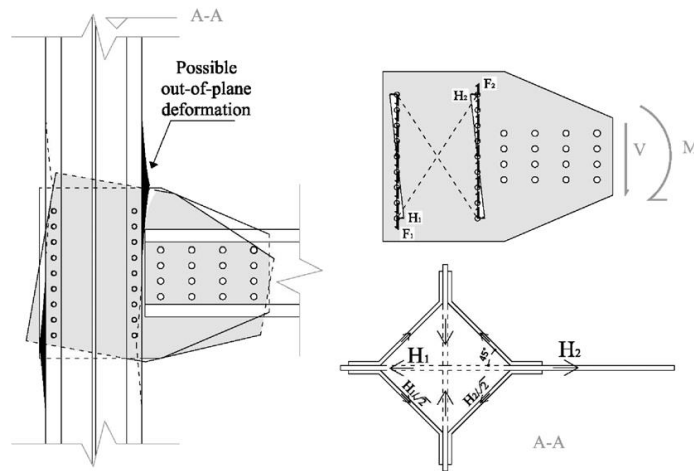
In-plane action of the column walls with through plate connection [13].
